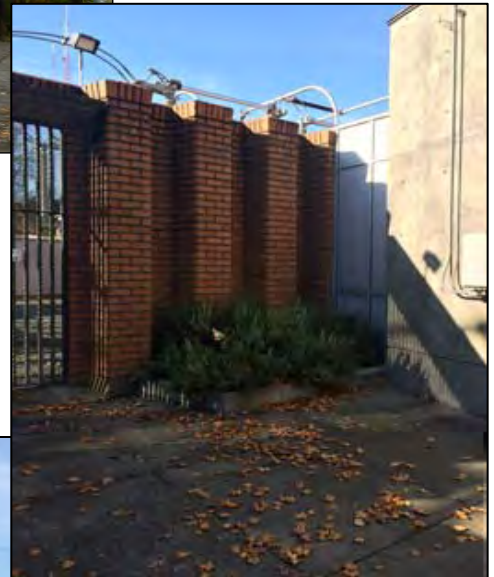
Below, view looking generally west at the east facade of the original masonry section and concrete expansion sections that make up the control building.
